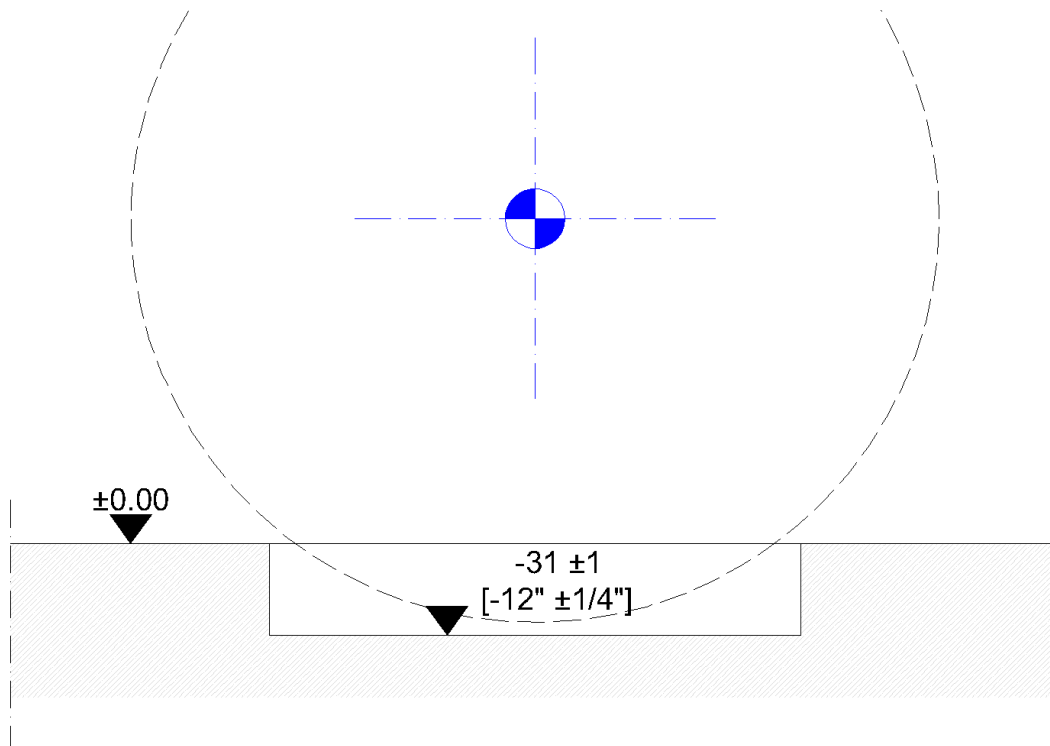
Treatment Room Floor Pit – Section with Gantry Rotation
